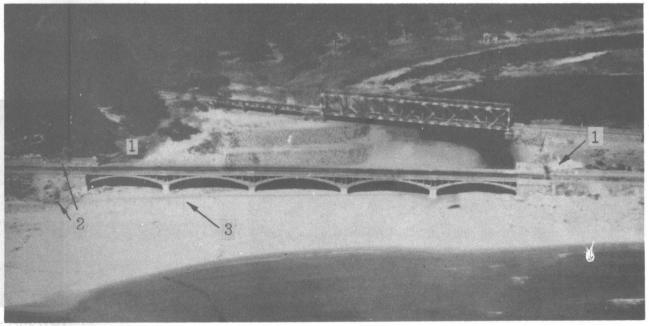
Beach 264 U-557309. Highway and Railway bridges over Villepey River. (1) Roadblocks. (2) Pillboxes. (3) Barbed wire.
